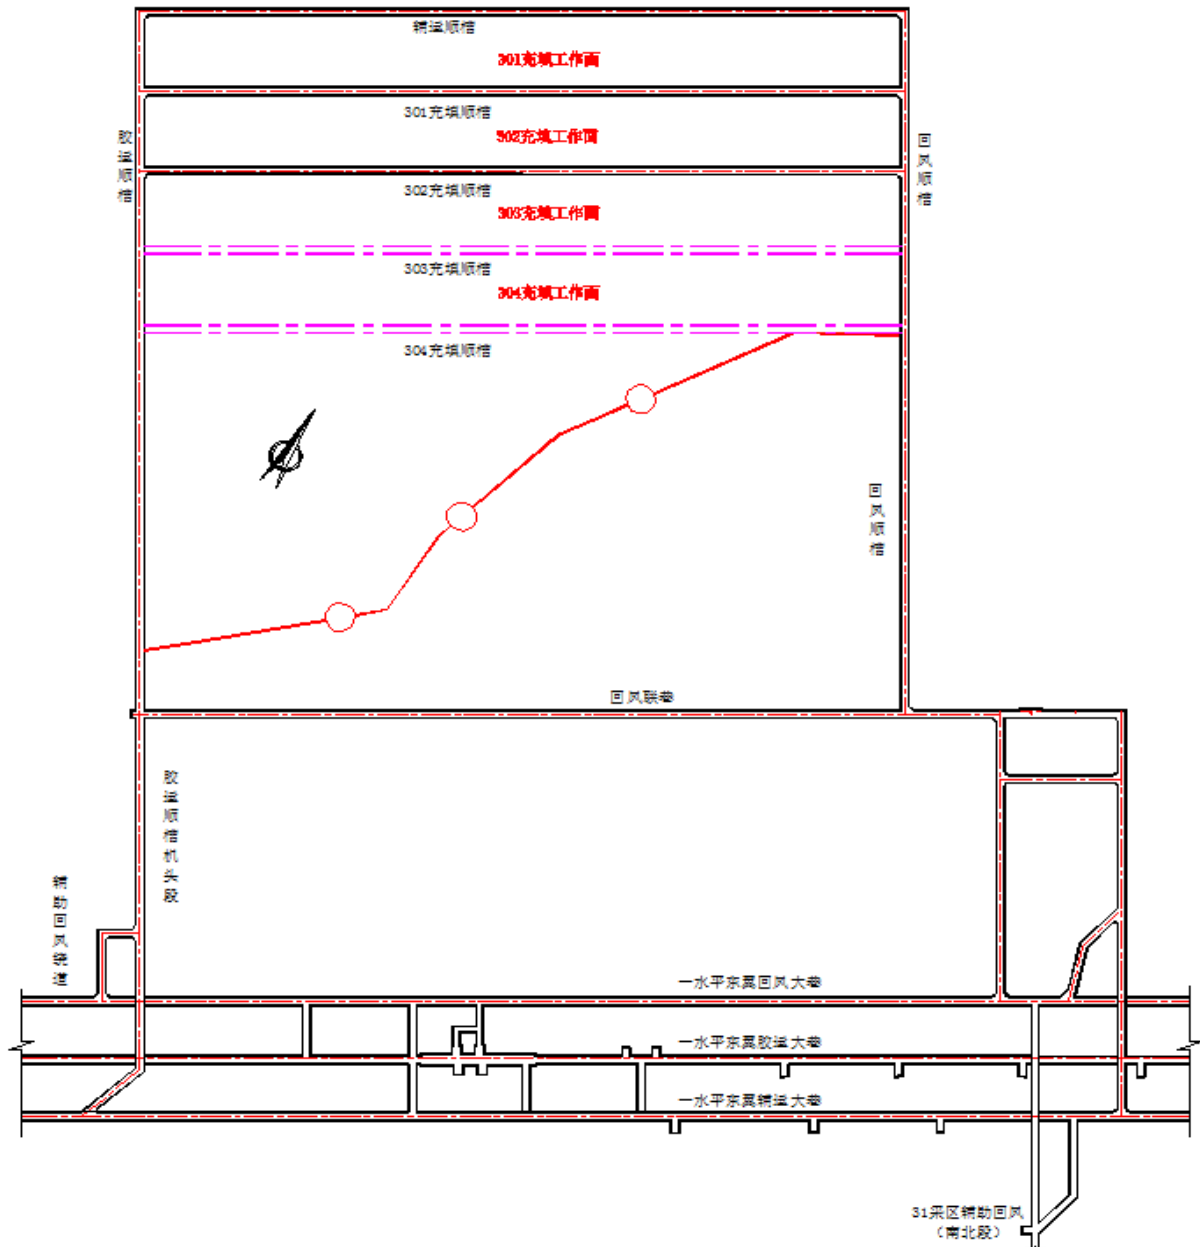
The layout of roadways of continuous mining and filling working face in the test mining area
